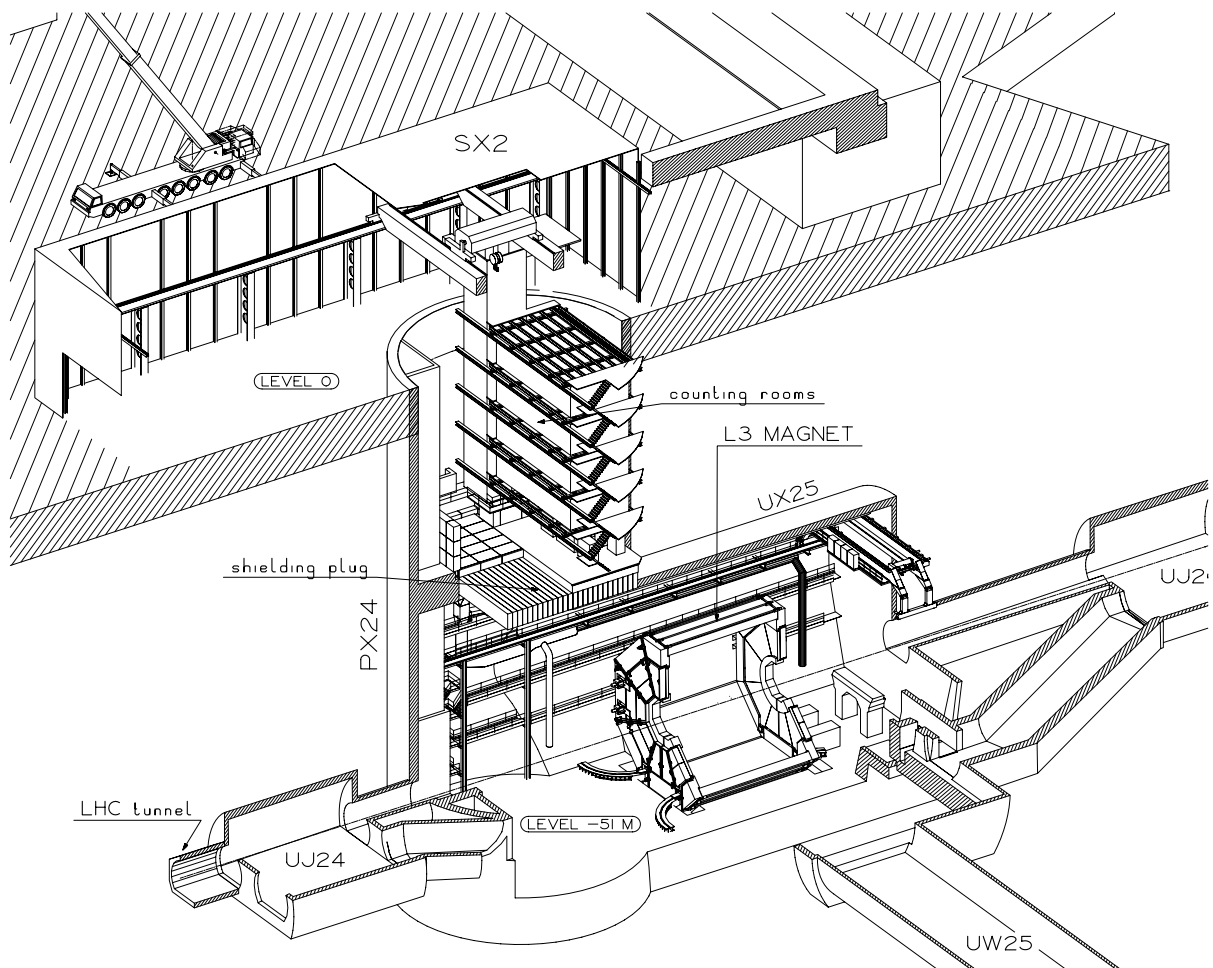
General layout of the basic underground structures at Point 2, showing the L3 magnet and the counting rooms.
